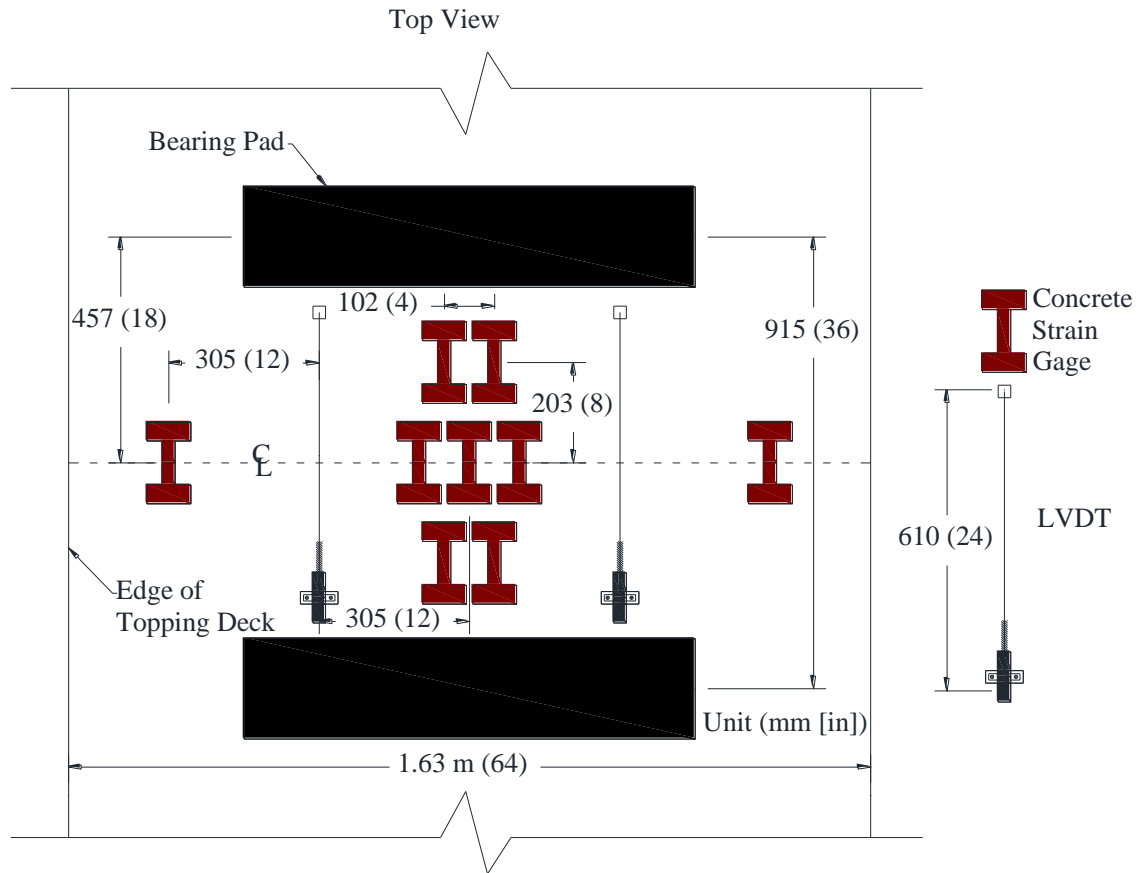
Strain Gage and LVDT Layout on Topping Deck at Middle of the Girder (Flexure Test).
